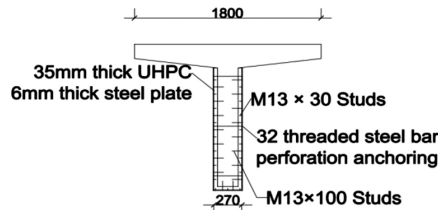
Schematic diagram of T-beam reinforcement (unit: mm)
